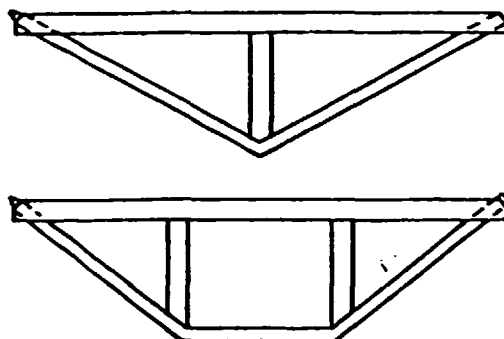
Use of the Barap tie to stiffen and strengthen a hip rafter. Trussed beam with king post (top) and with queen post (below)
